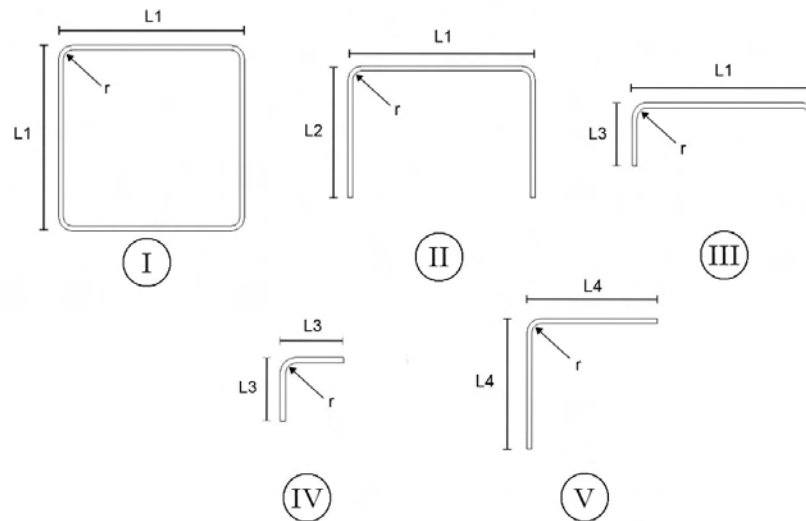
Sketch of cross-section shape and dimensions for all five specimens considered
